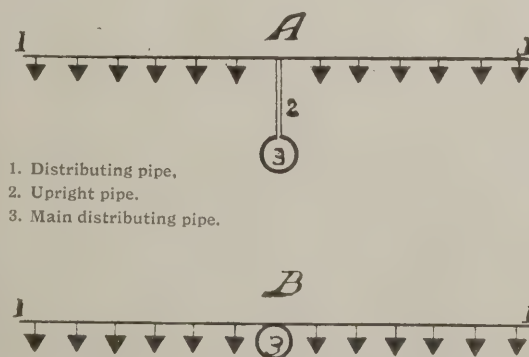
ARRANGEMENT OF SPRINKLERS.
